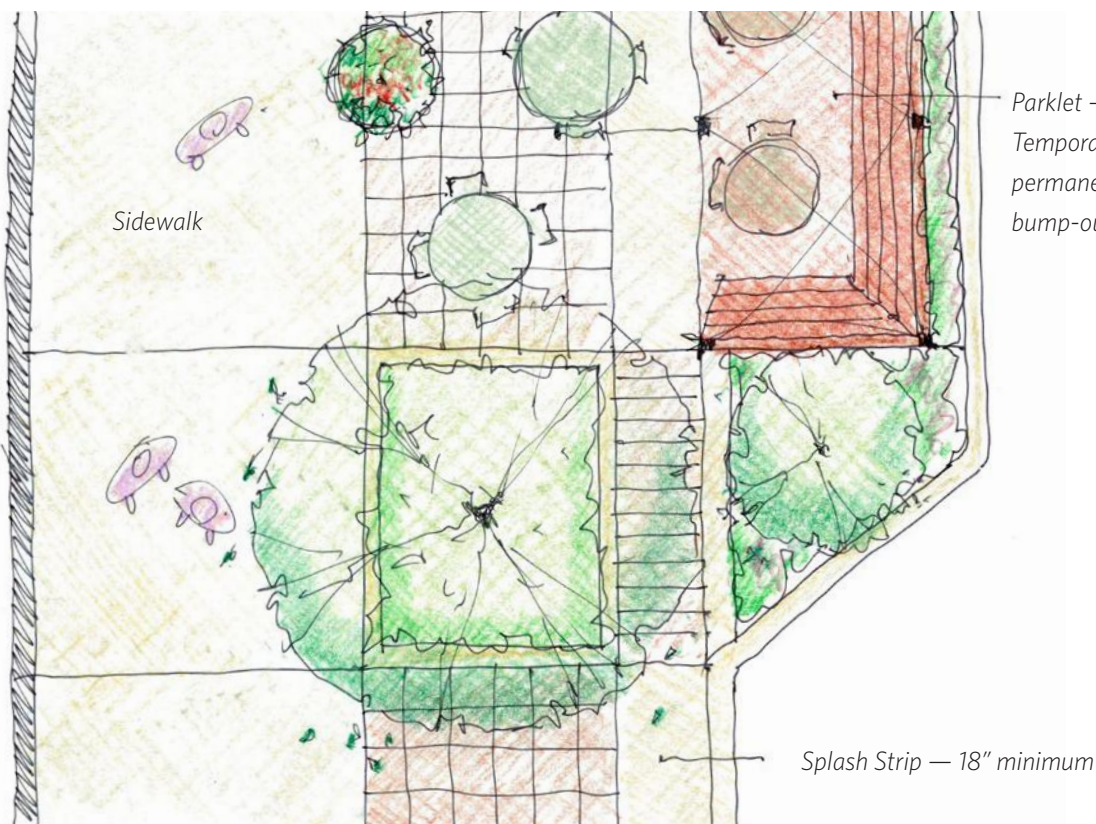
Street Tree Planting Details with Soil Cells — Plan
